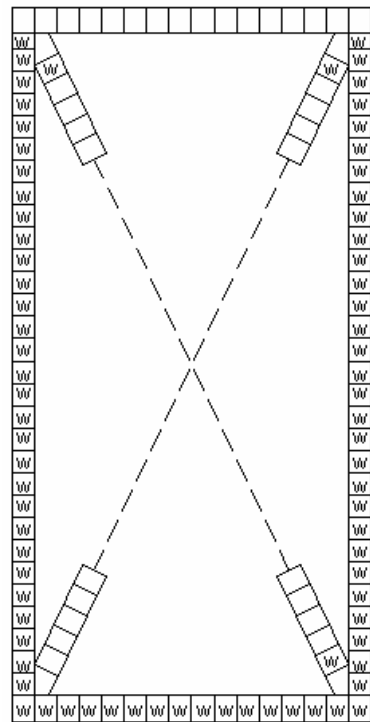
Sheathing nail failure modes for Wall A4.
